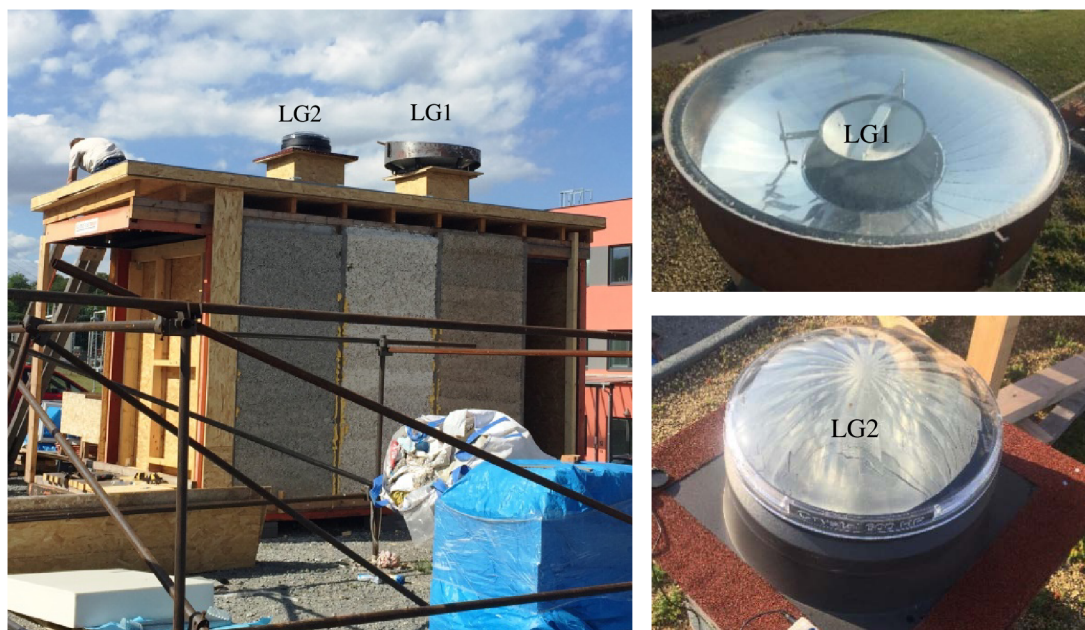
Tested light guides LG1 and LG2 – the roof installation
